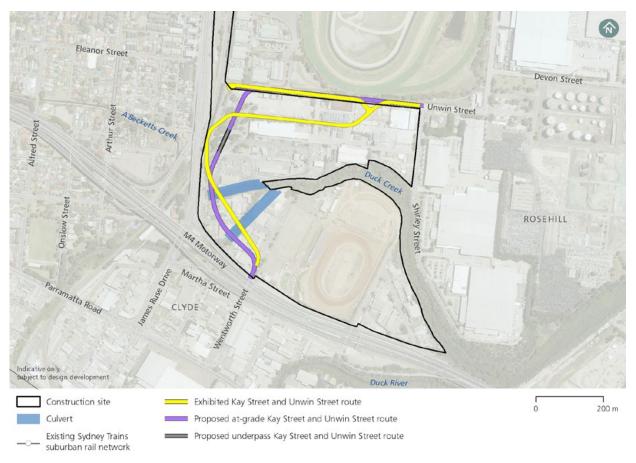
Kay Street and Unwin Street route realignment – (approved project) (Sydney Metro, 2020b)
